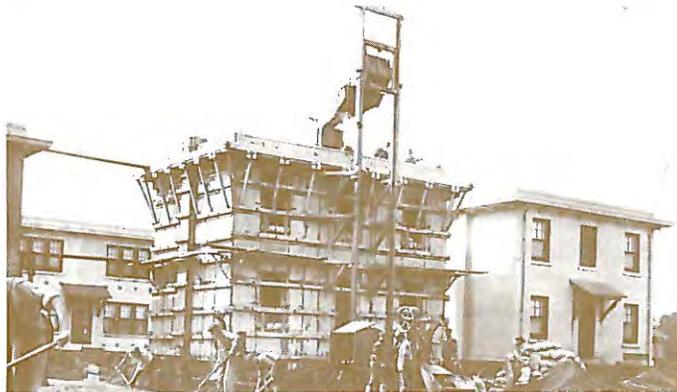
Thomas A. Edison's Cast-in-Place Houses, Union Township, New Jersey (1909). This construction photo shows the formwork for the cast-in-place reinforced concrete houses built as low-cost housing using a standard 25- by 30-foot module. Photo: Edison National Historical Site.
